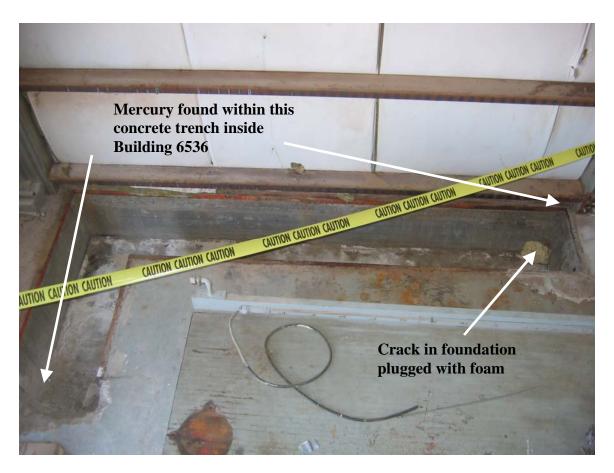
Photograph showing trench inside Building 6536, July 2005.
